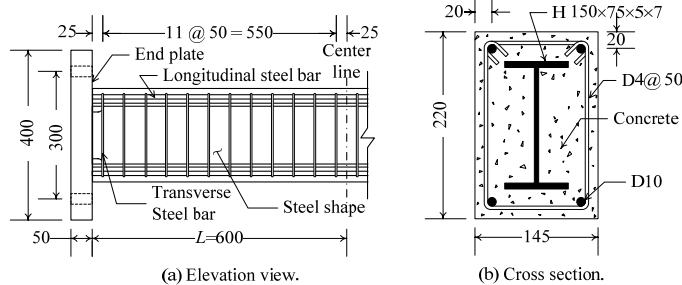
Geometry and dimensions of specimens (unit: mm)
